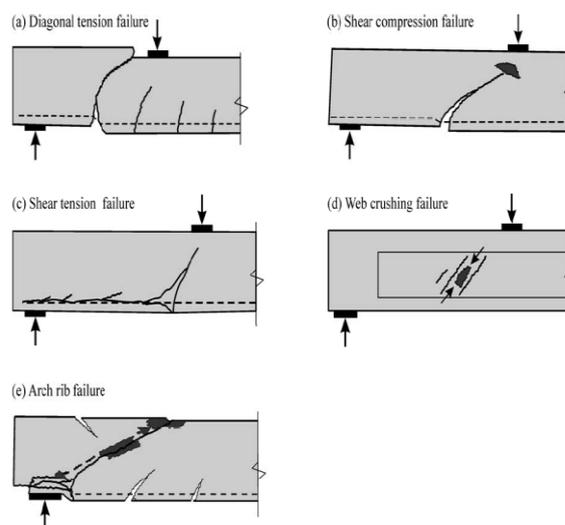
Modes of shear failure of concrete beams [Pillai et al. (2003)].
